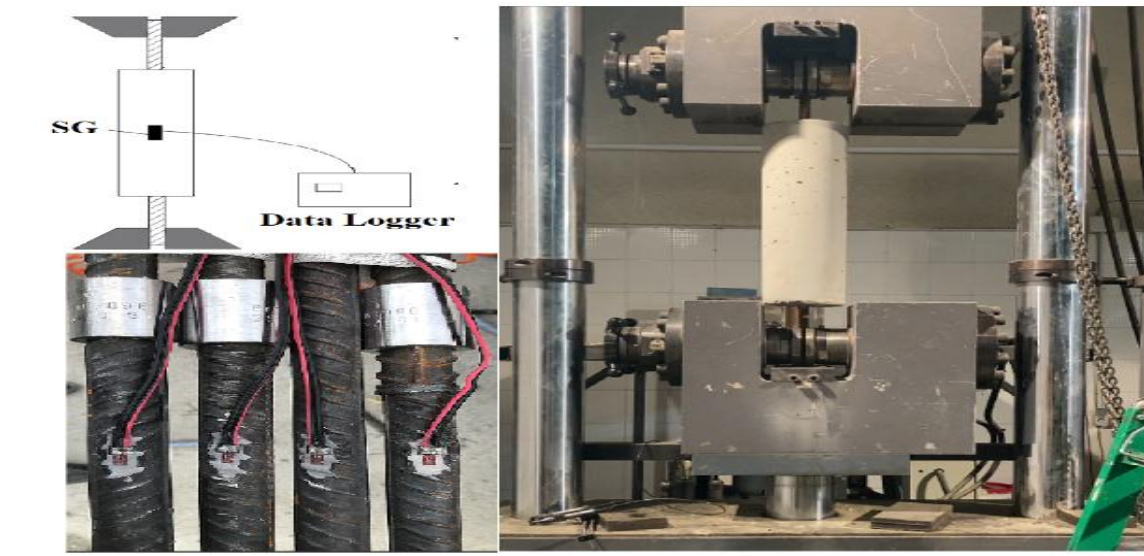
Testing configuration for without concrete specimens and with concrete specimens.
